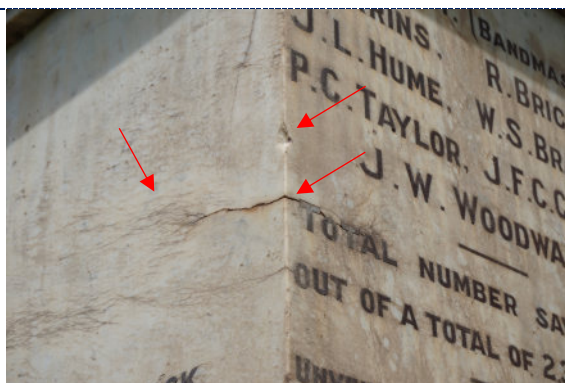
Detail – dirt particulate, small horizontal cracks in marble substrate; loss to marble edge.
